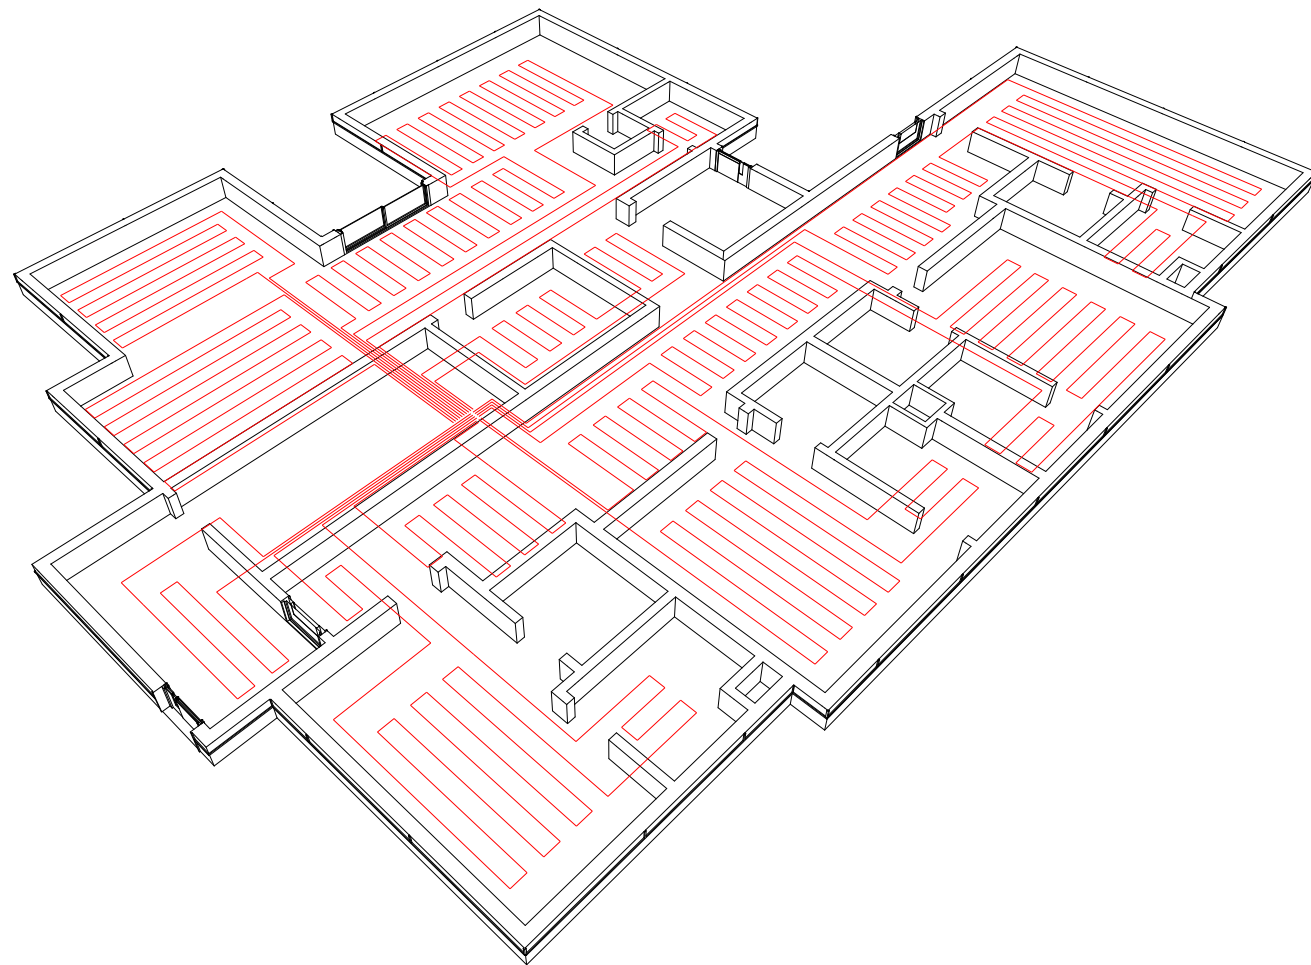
| Diagram showing proposed radiant floor heating layout for the residential buildings
